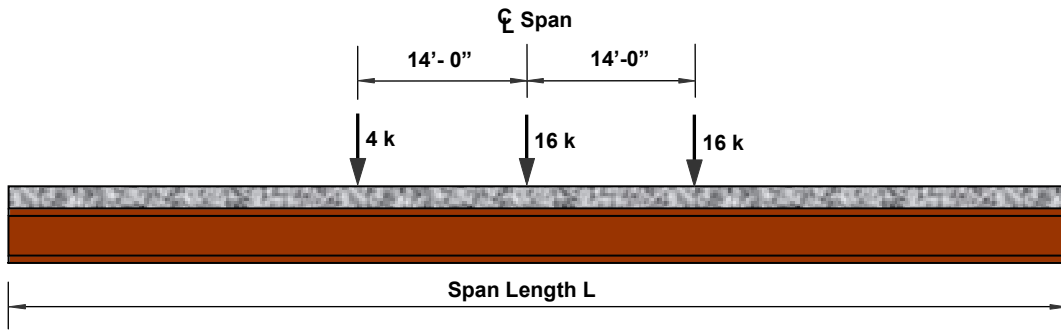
Elevation and longitudinal loading positions for girders found in Table 6.1
